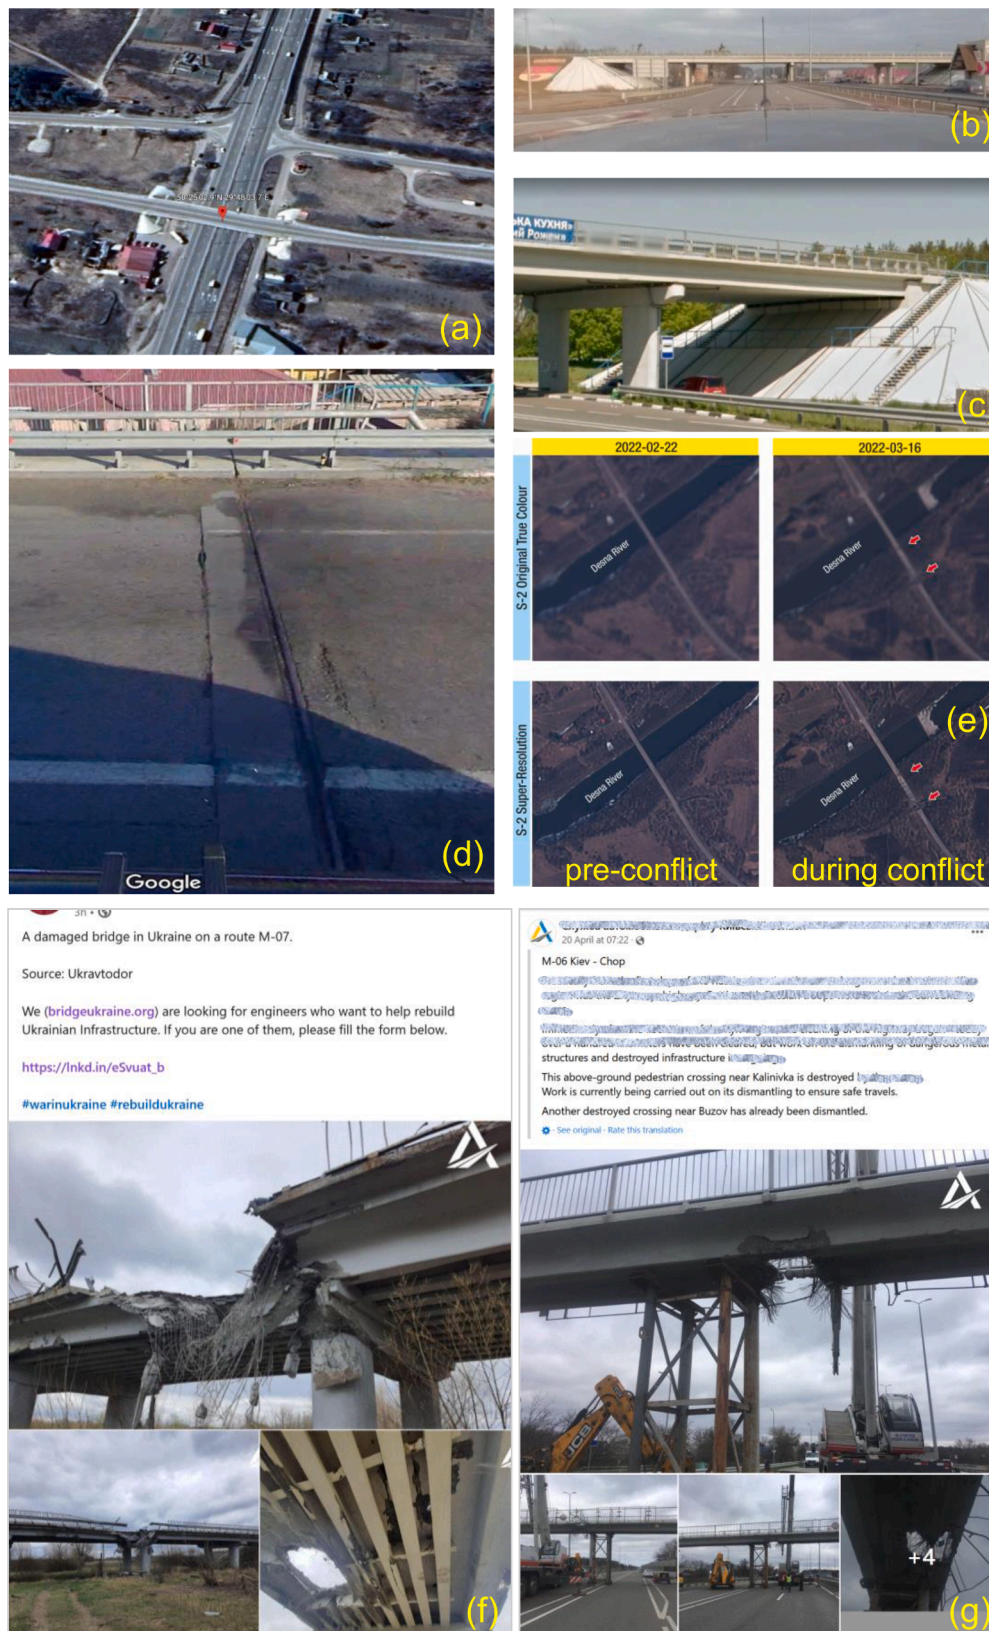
The level of knowledge for RBA enhancement (a) bridge topology, (b) Google Street View of the bridge elevation and geometry, (c) view of the bridge typology (deck, pier and embankment), (d) the expansion joint of the bridge (used to assess the length of the spans), (e) the satellite images before and during conflict (Copernicus Sentinel-2 10 m optical imagery), (f) and (g) bridge damage crowdsourcing from social media (some sentences were intentionally deleted to exclude comments from users that take sides and ensure anonymity).
